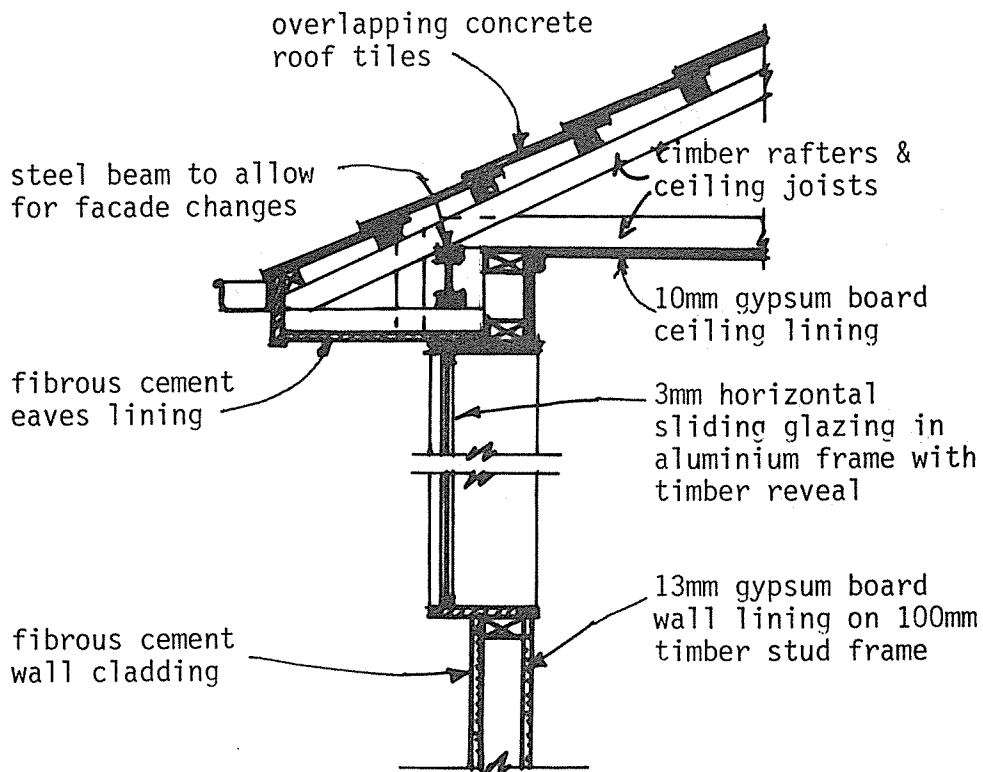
SINGLE GLAZED WINDOWS IN TIMBER STUD FRAME FACADE
